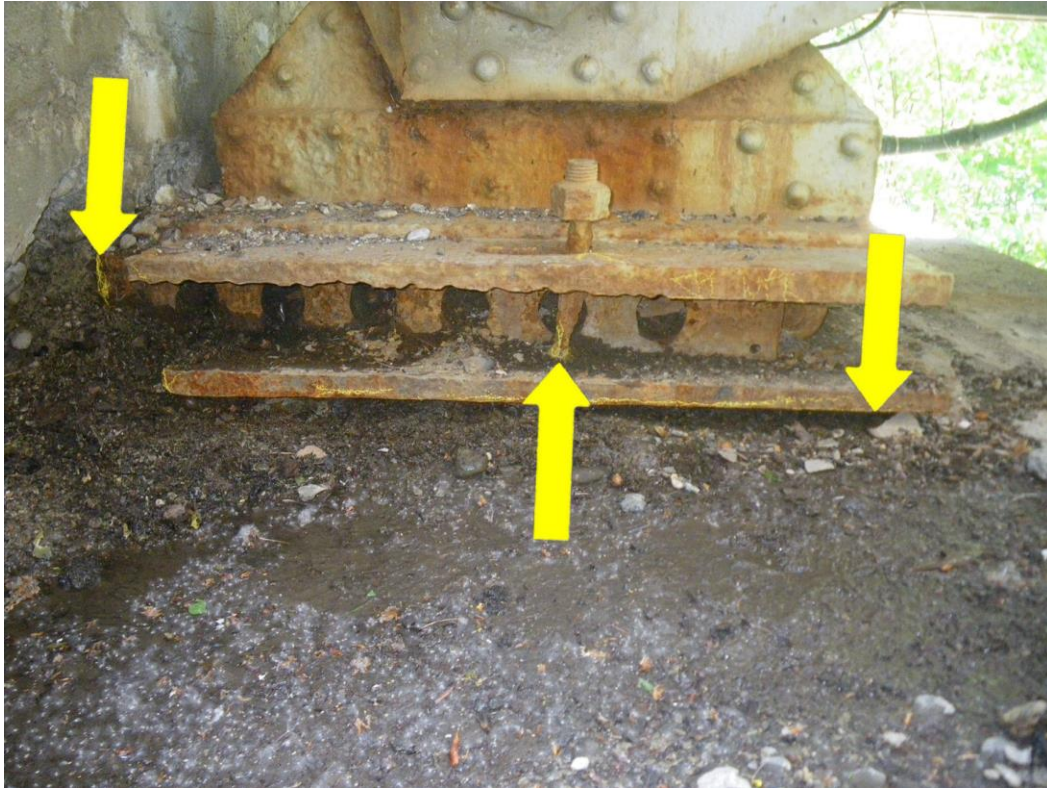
West Truss Bearing at South Abut., East Face, Span 4 - Nested roller assembly expanded beyond masonry plate, in contact w/ backwall & detached vertical plate. Note anchor bolt severely bent w/ section loss & in contact w/ sole plate slotted hole edge, angle section loss w/ rivet head loss & undermining of masonry plate.
